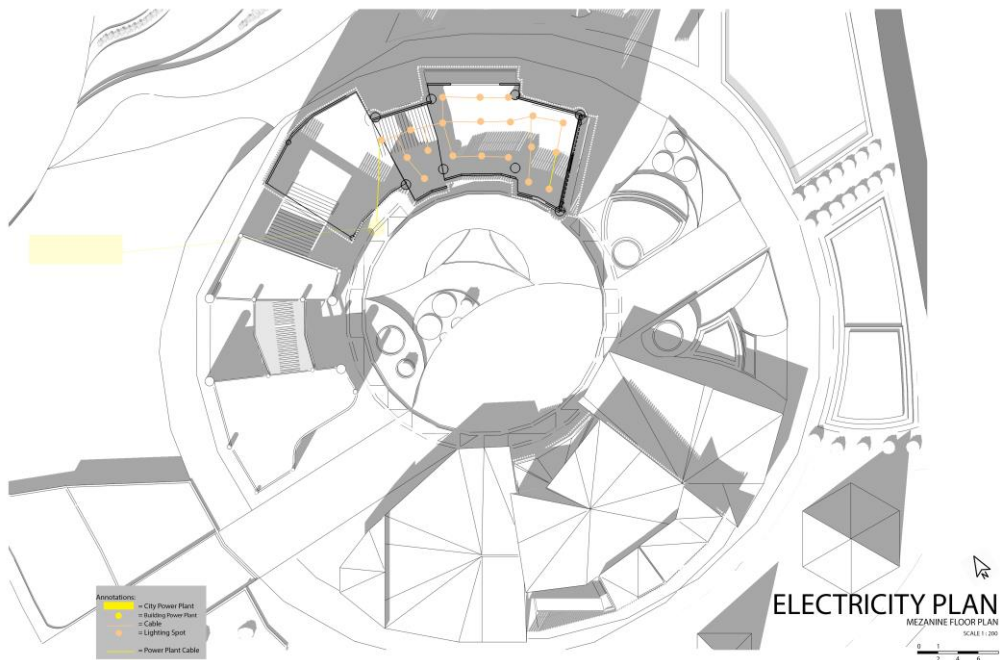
Electricity Mezanine Floor Plan (Source: author analysis)
